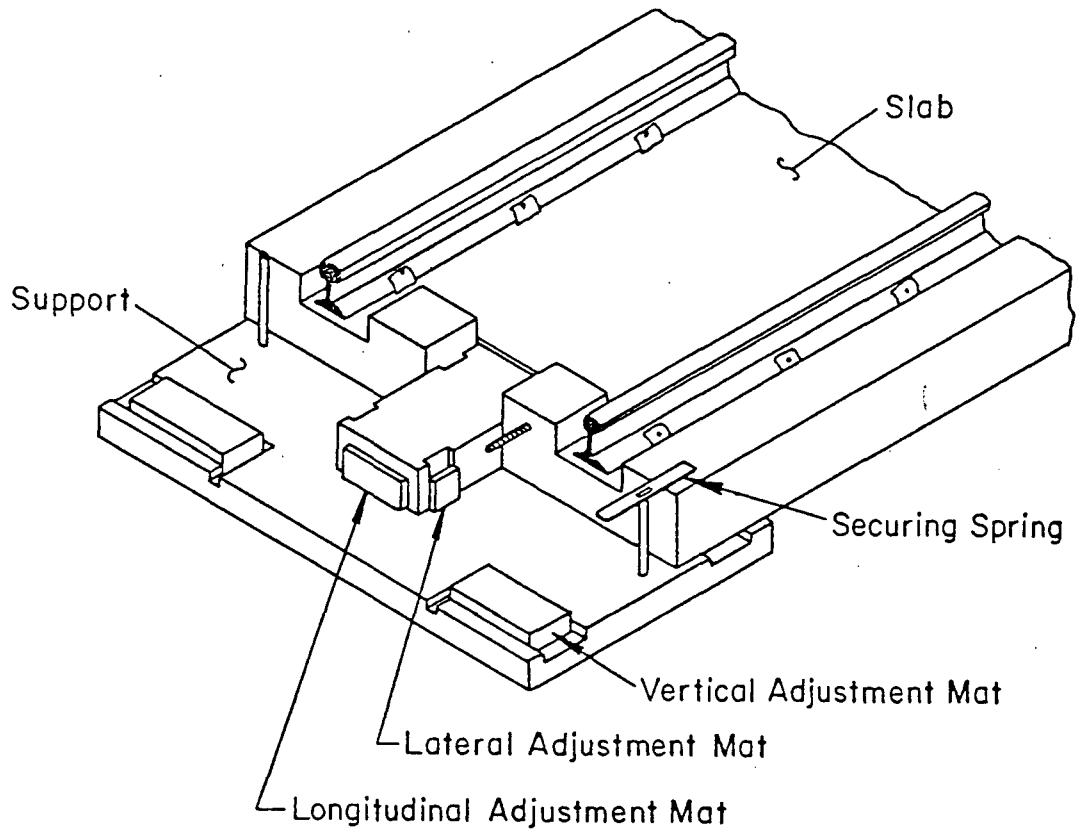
Japanese Railroad Maintenance Track Slab (JRM)
